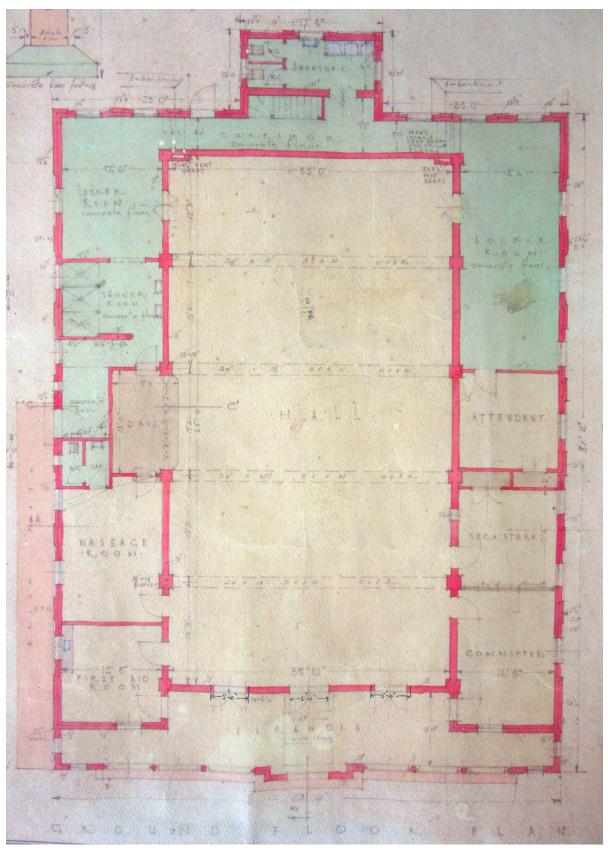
The ground floor plan shows the rooms similar to the plan Index No 432616 but that plan has a side passage that was not built. Instead the attendants room and cupboards were built as shown on this plan. Note the colours are the standard drawing convention, green indicates concrete flooring to the wet areas, red indicates brick and yellow indicates timber. Source: Waverley Council Index No 432619
